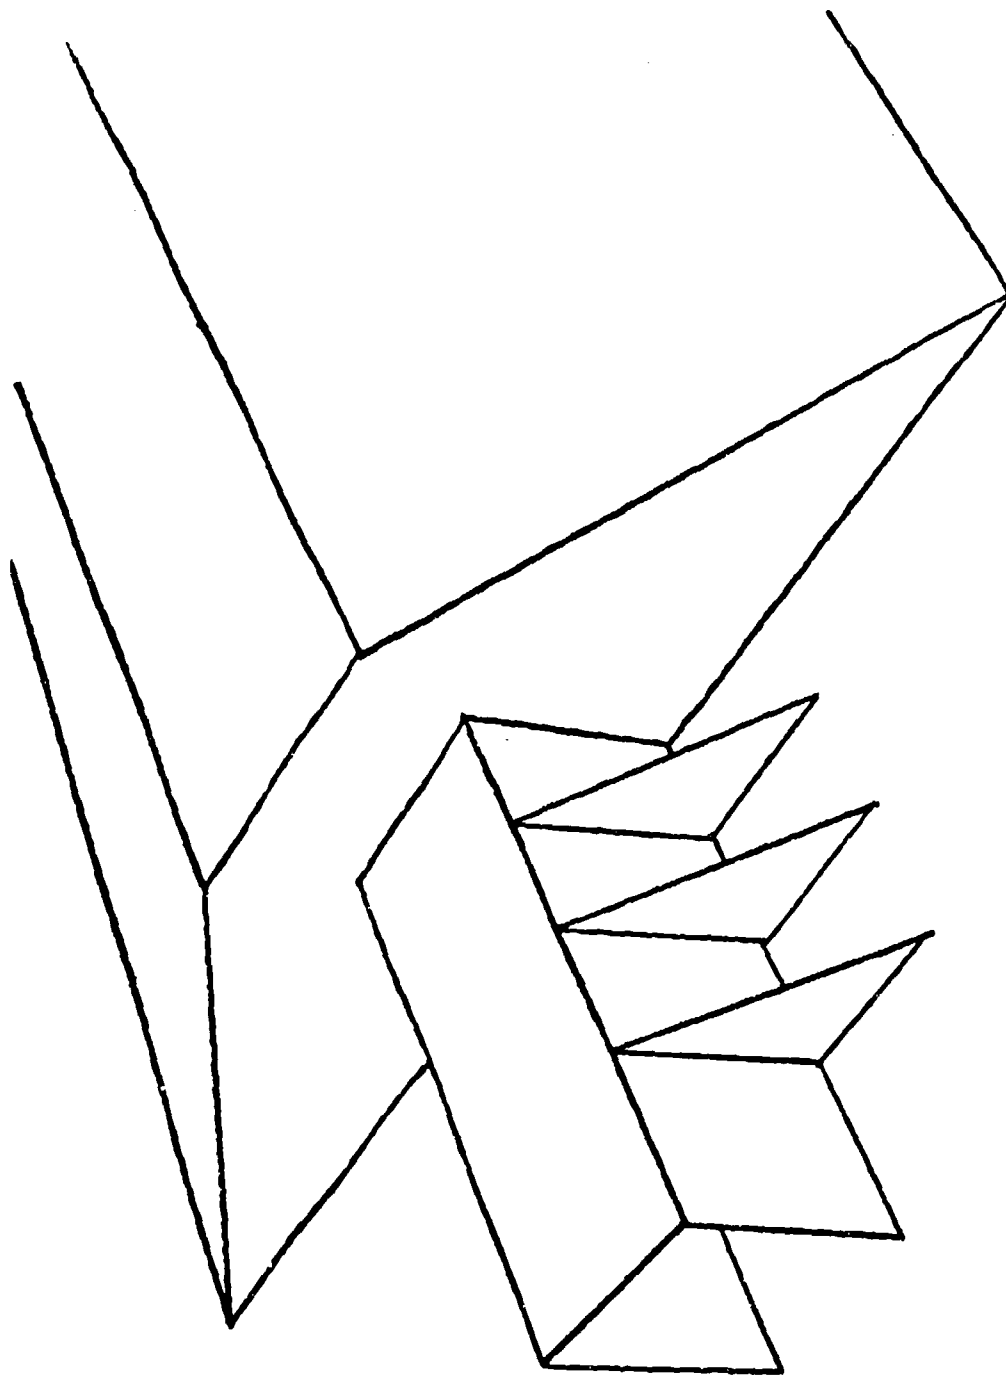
ENTRANCEWAY ADDITION DESIGN
